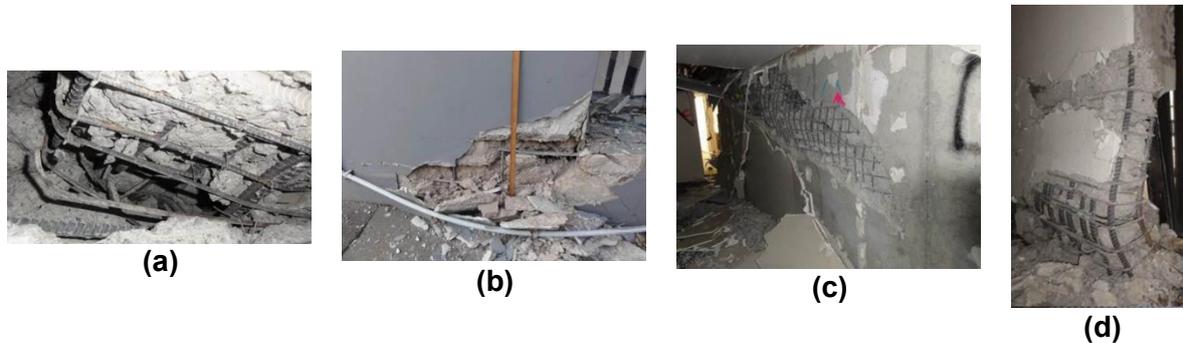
Observed Failure modes of structural walls during past earthquakes: (a) Bar yielding followed by bar rupture (b) Toe crushing (c) Diagonal shear (d) Compression failure and buckling (Kam et al., 2011)
